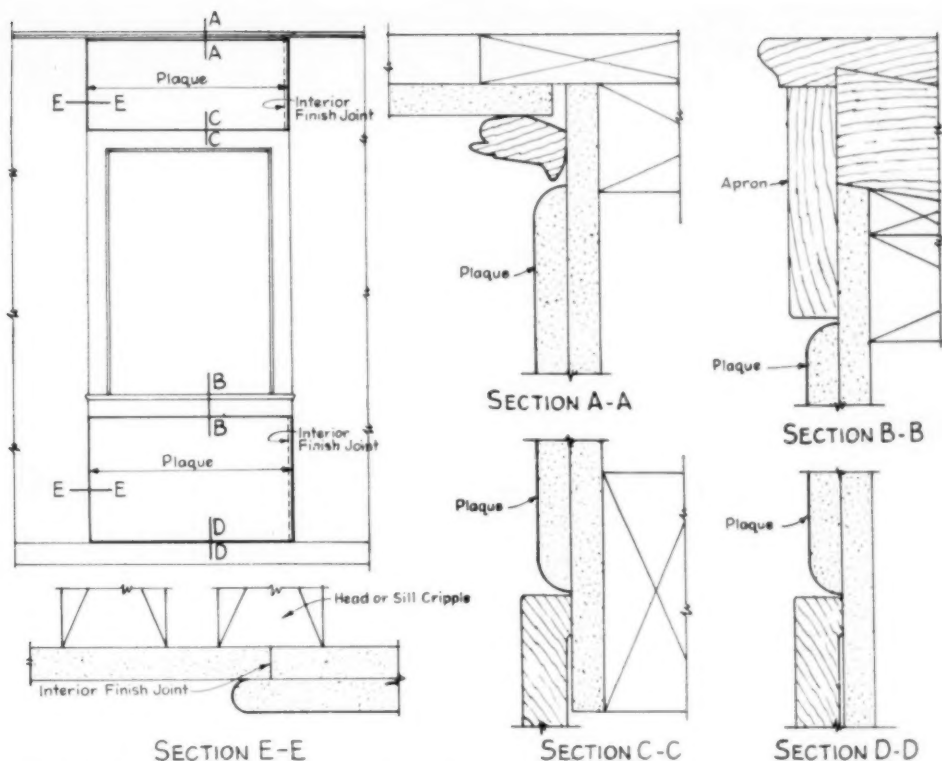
Interior plaques shown on window elevation, plus details of cornice (A-A), stool (B-B), base (C-C, D-D) and side (E-E)
